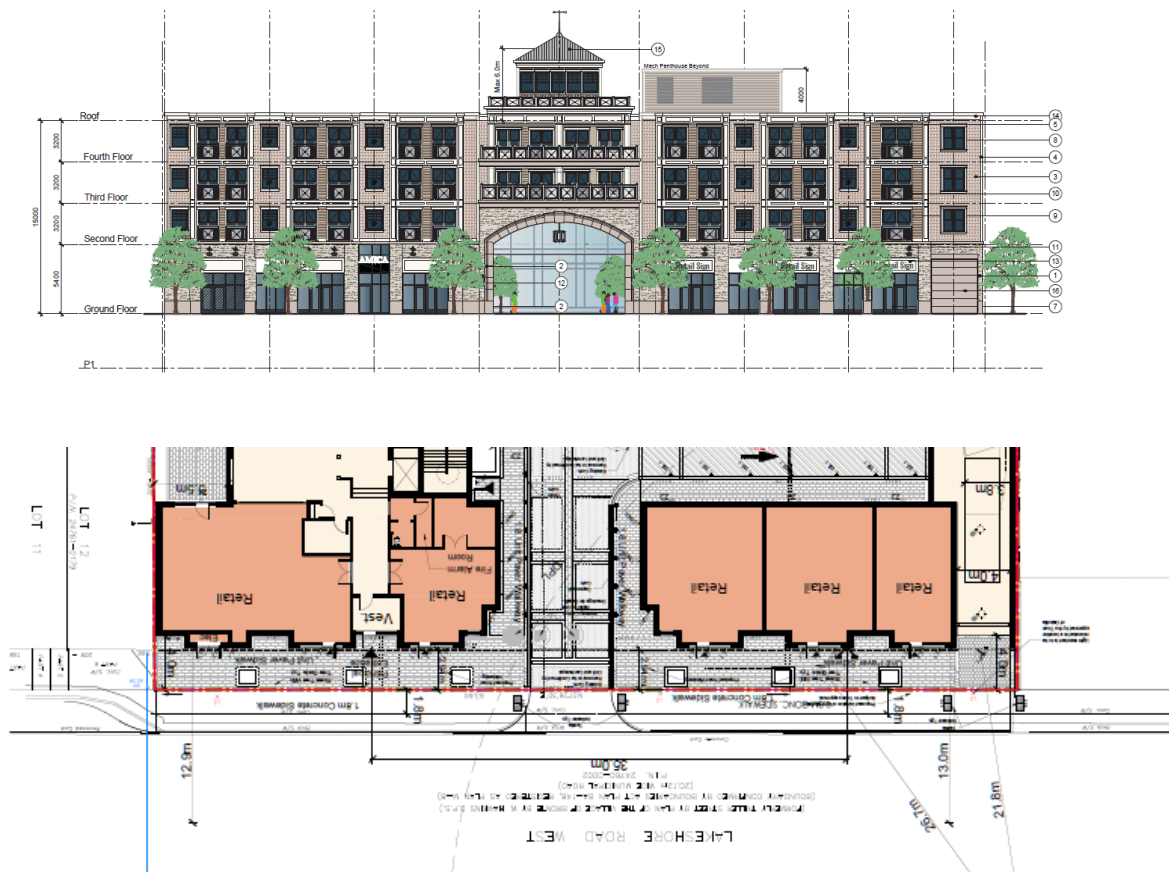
Extracts from elevation and floor plan of site plan SP.1729.041/02
